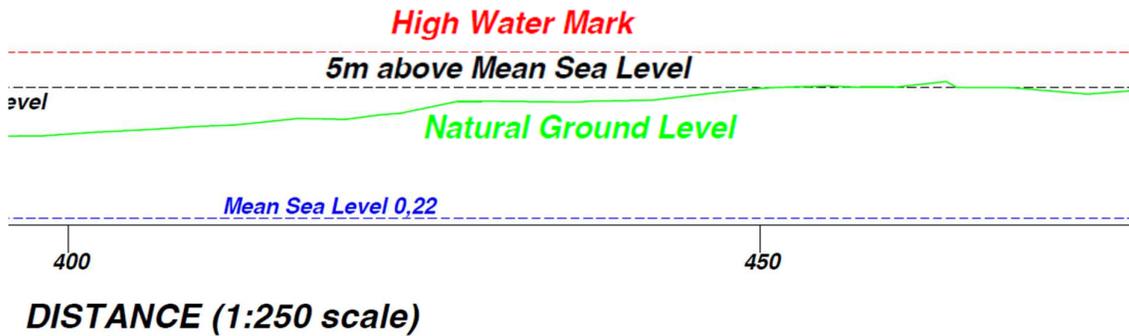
D: STORMWATER: PART 2 OF SECTION A-A
